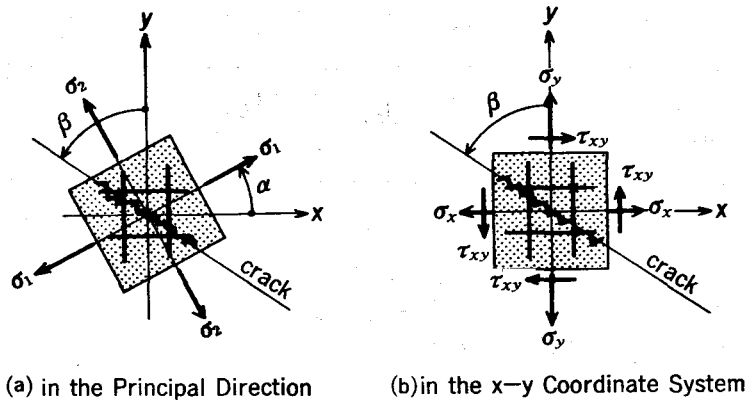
Reinforced Concrete Panels subjected to In-Plane Forces
